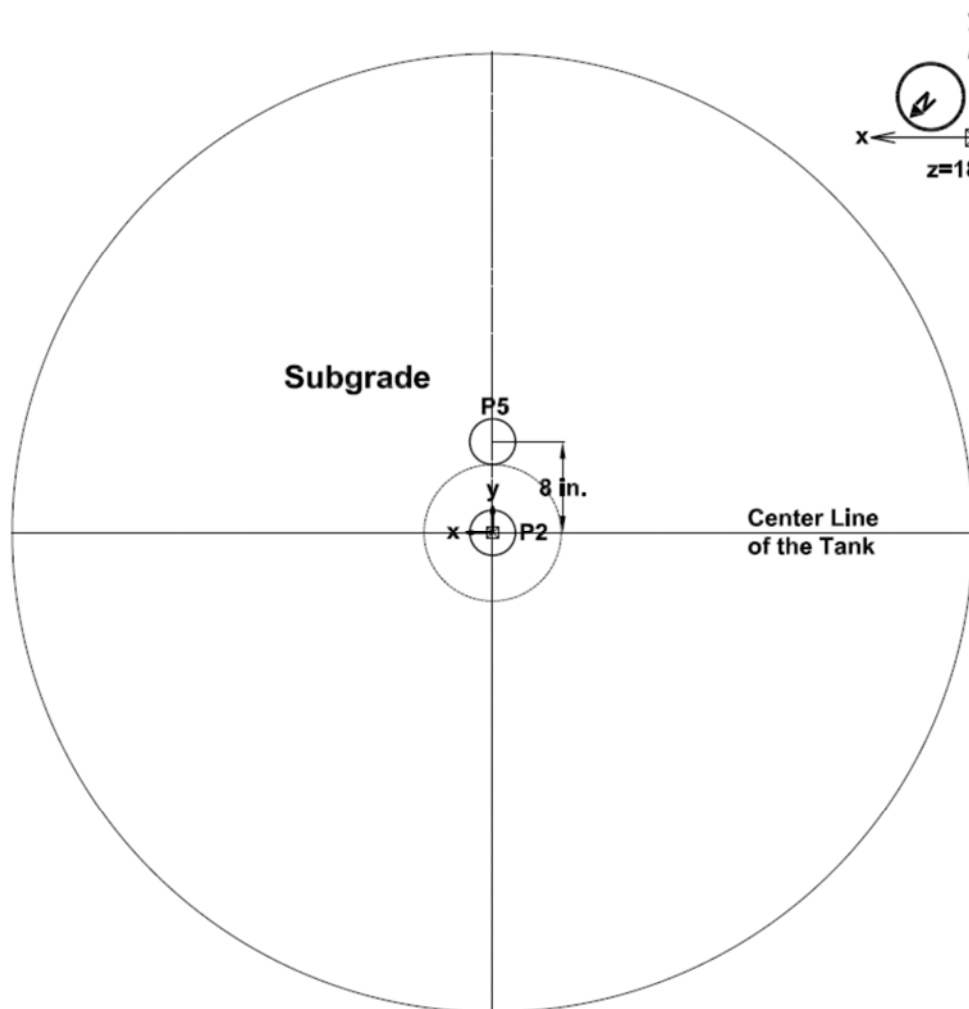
Instrumentation plan for experiment No. 6—Profile view at $Z = 18$ inches
